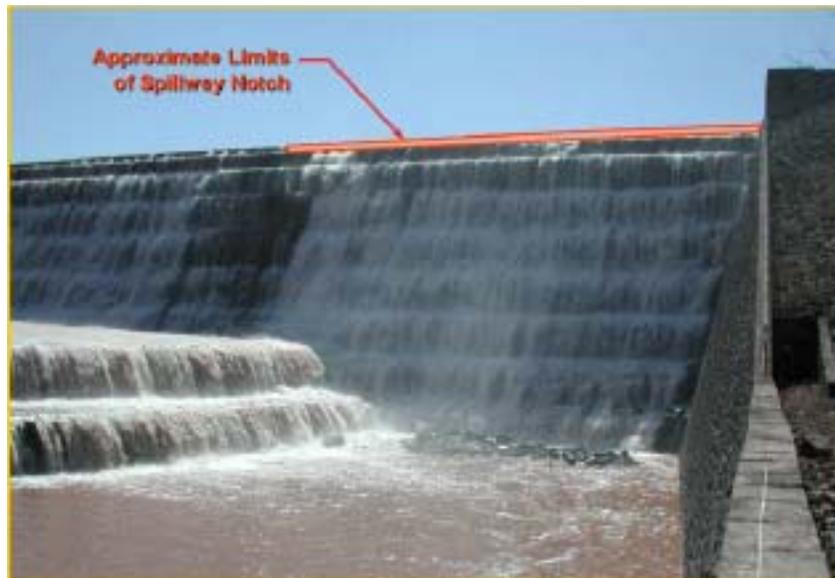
PROPOSED CREST GATES INSTALLATION AT GILBOA DAM
